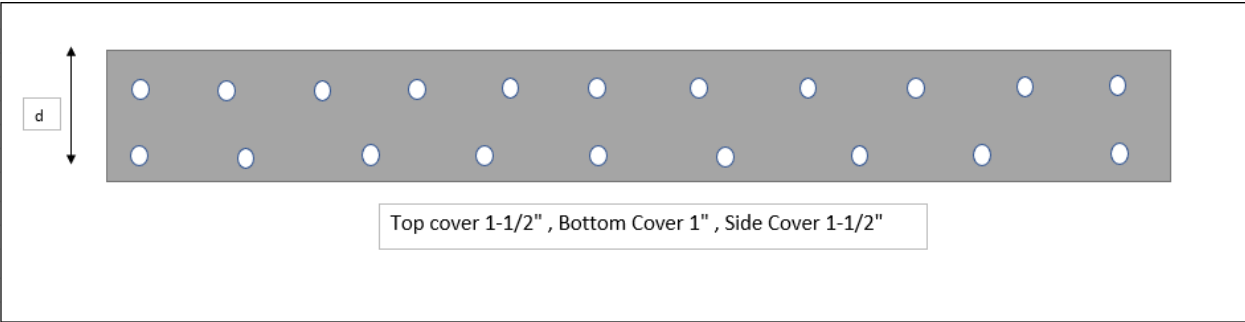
Concrete Deck and Proposed Rebar Cage Installation
